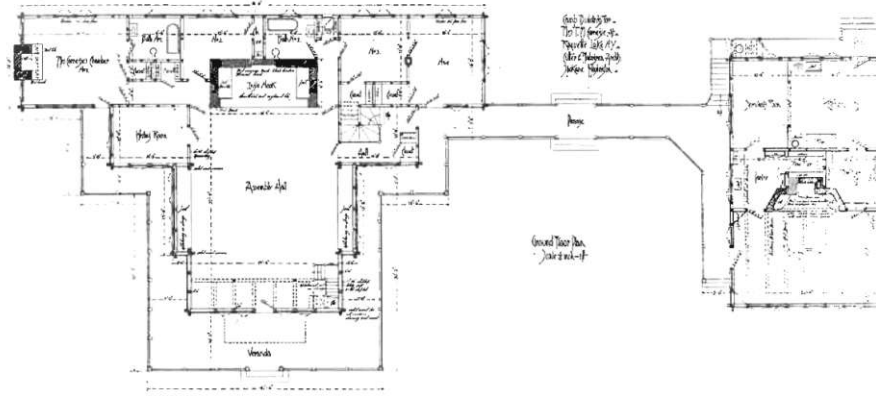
First floor plan of the assembly hall and dining hall of Carnegie Camp
